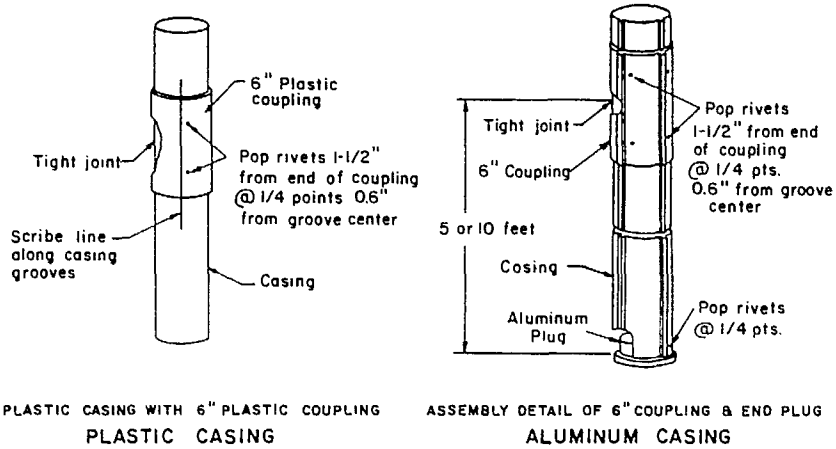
Examples of non-telescoping inclinometer casings and fittings.
